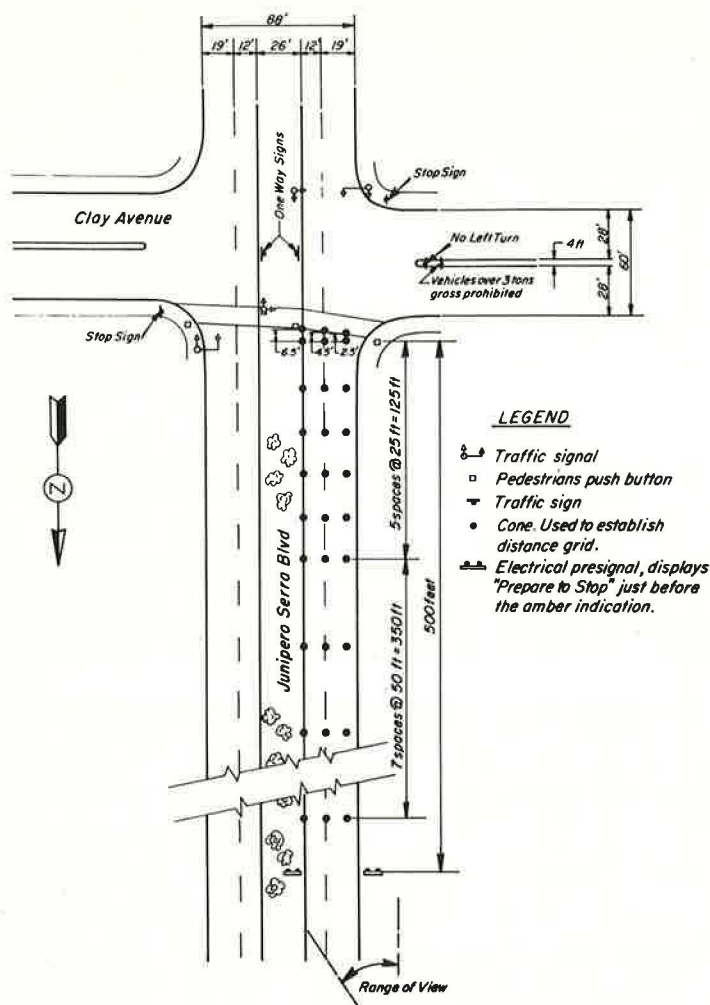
Junipero Serra Blvd. at Clay Ave., experiment layout.
